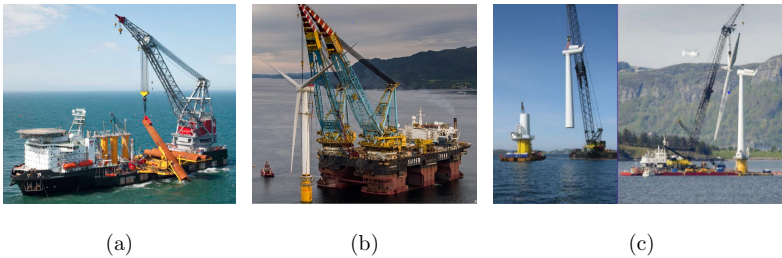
Examples of offshore wind turbine installation by using floating vessels. (a) installing a monopile for a bottom-fixed wind turbine by Oleg Strashnov, a mono-hull vessel (Seaway Heavy Lifting, 2018). (b) installing the tower and rotor-nacelle-assembly for a floating wind turbine by SAIPEM 7000, a semi-submersible vessel (Statoil, 2018). (c) installing tower-nacelle assembly (left) and rotor (right) for a floating wind turbine by a mono-hull vessel (Keseric, 2014).
